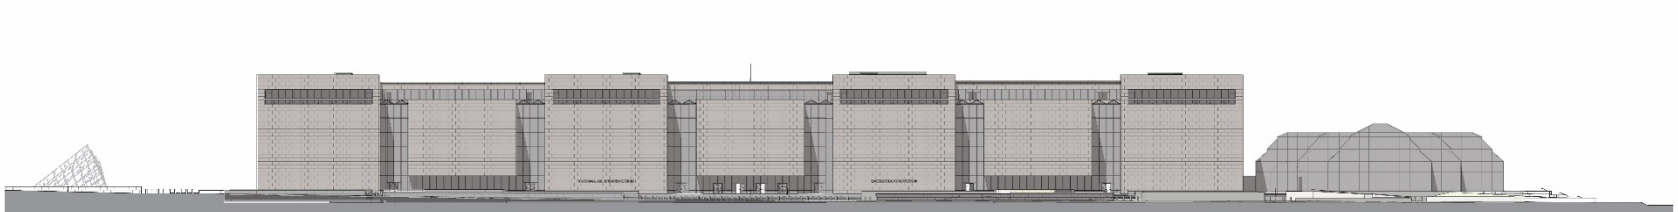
4: Existing south elevation along Independence Avenue, SW.(Source: QEA.)
